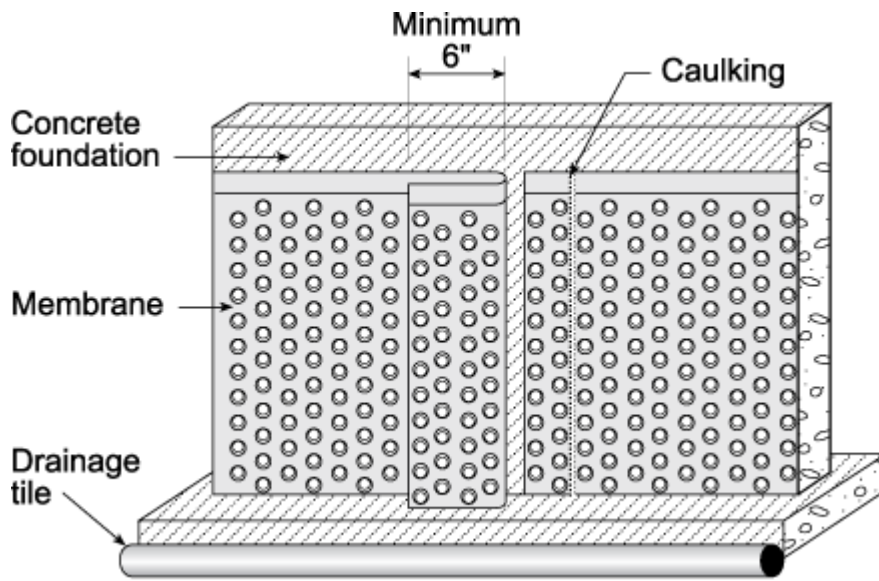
“Cosella-Dörken Delta-MS Dampproofing Membrane” – face in contact with the wall
